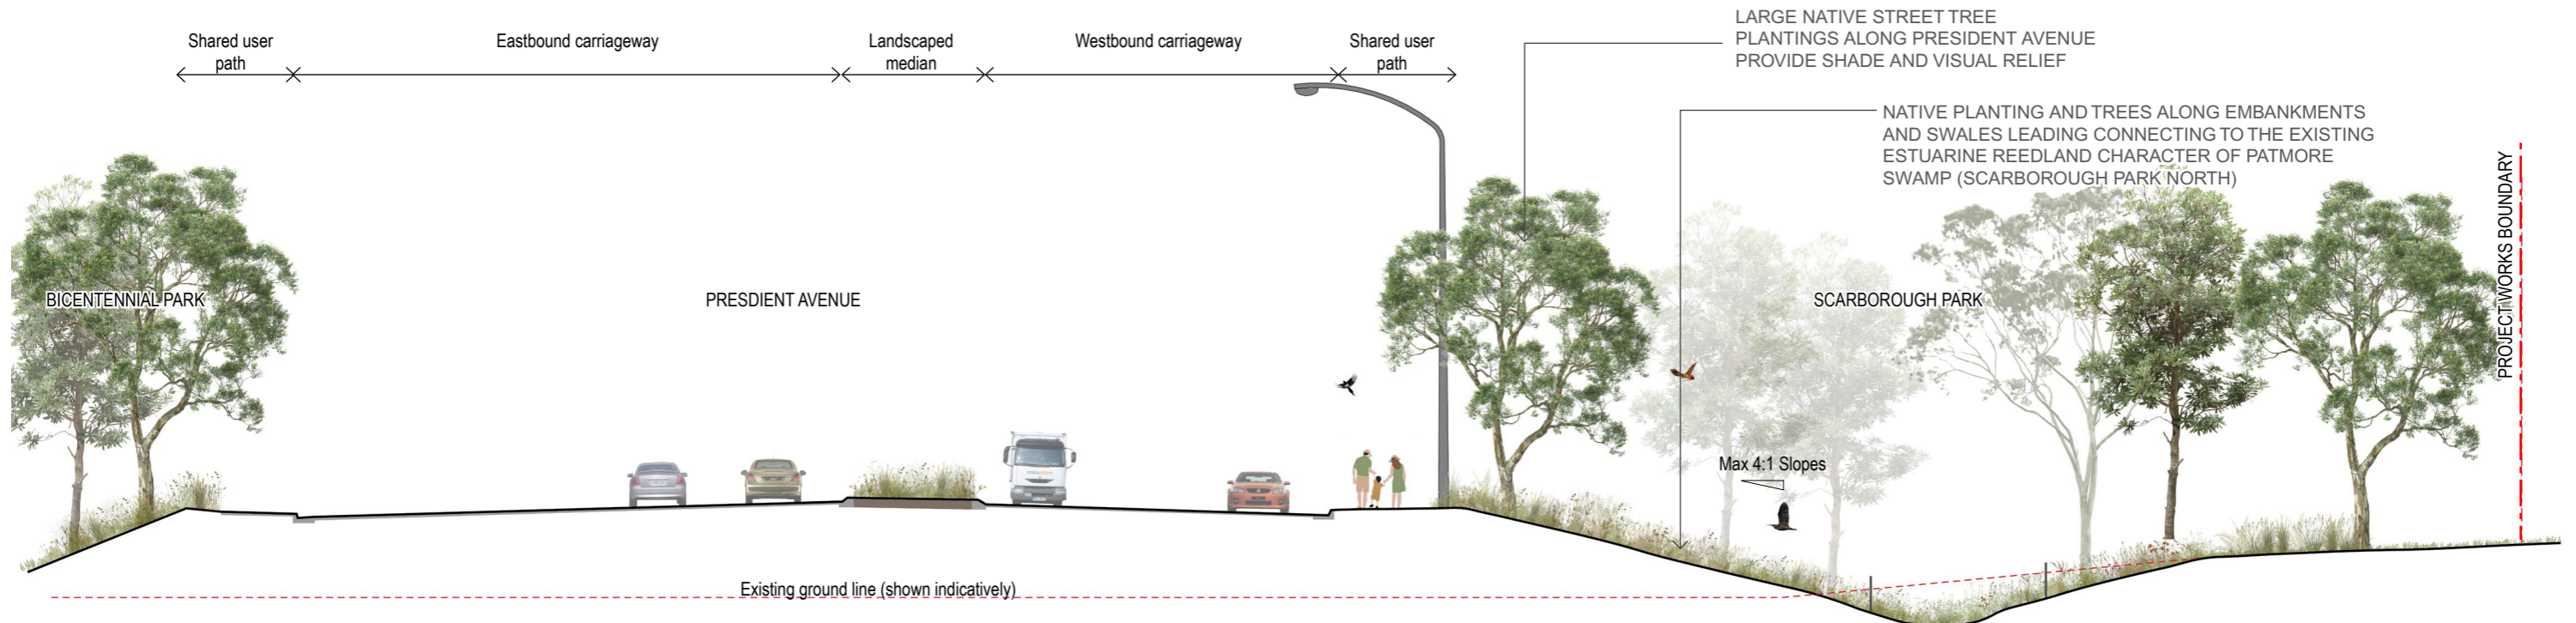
Section 02 - Typical section through President Avenue adjacent to Rockdale Bicentennial Park. Scale 1:200
